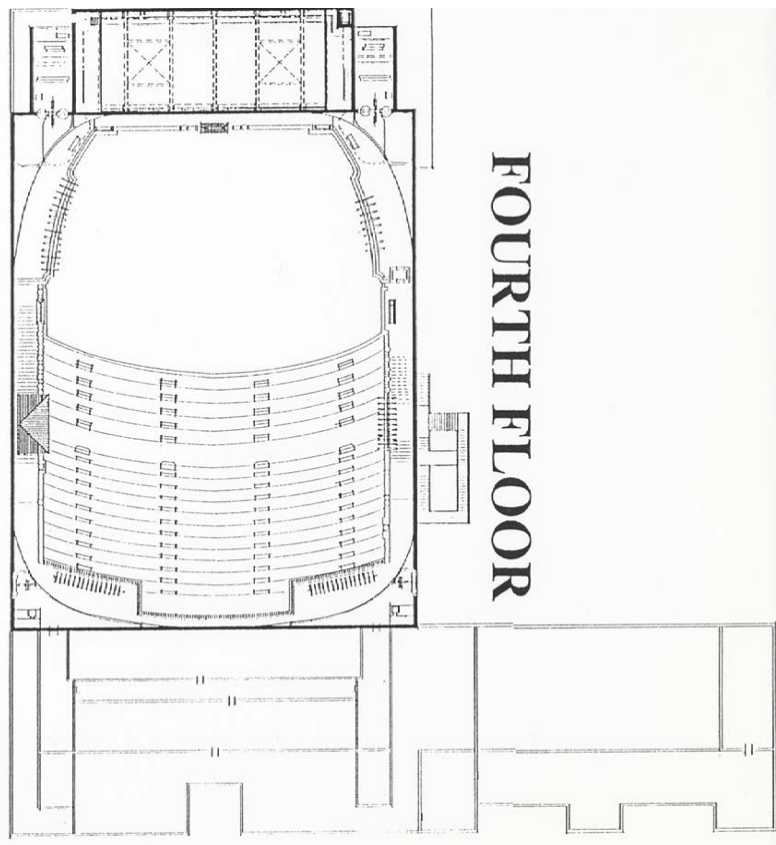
Redrawn fourth floor plan of Capitol Theatre
